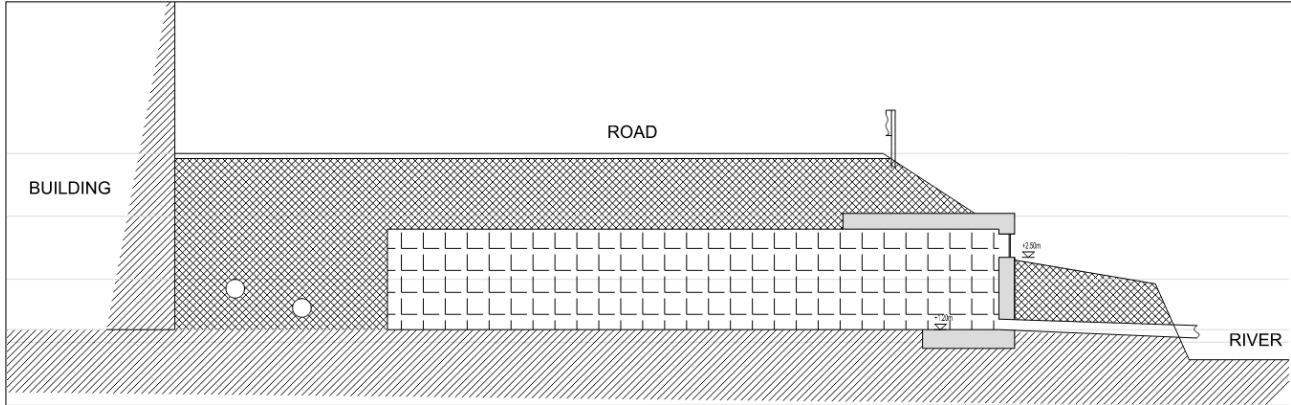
Cross section of the flood compensation storage under the proposed road, showing weir inlet, crates and outlet to river
